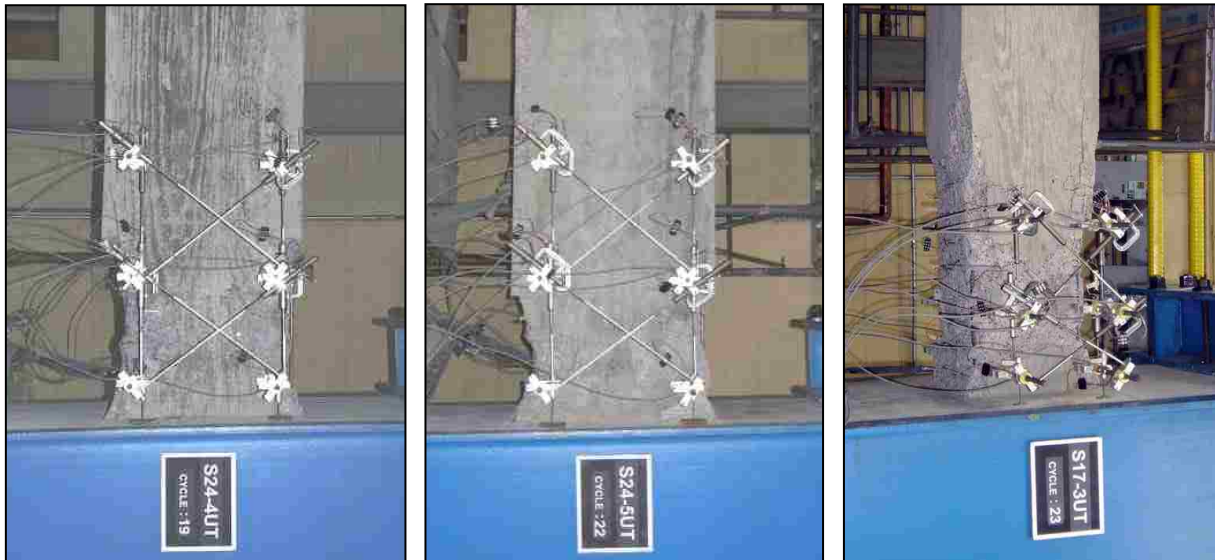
, 3.38, and 3.39 Concrete spalling on flexural and side face: experimental damage (Bae 2005)
